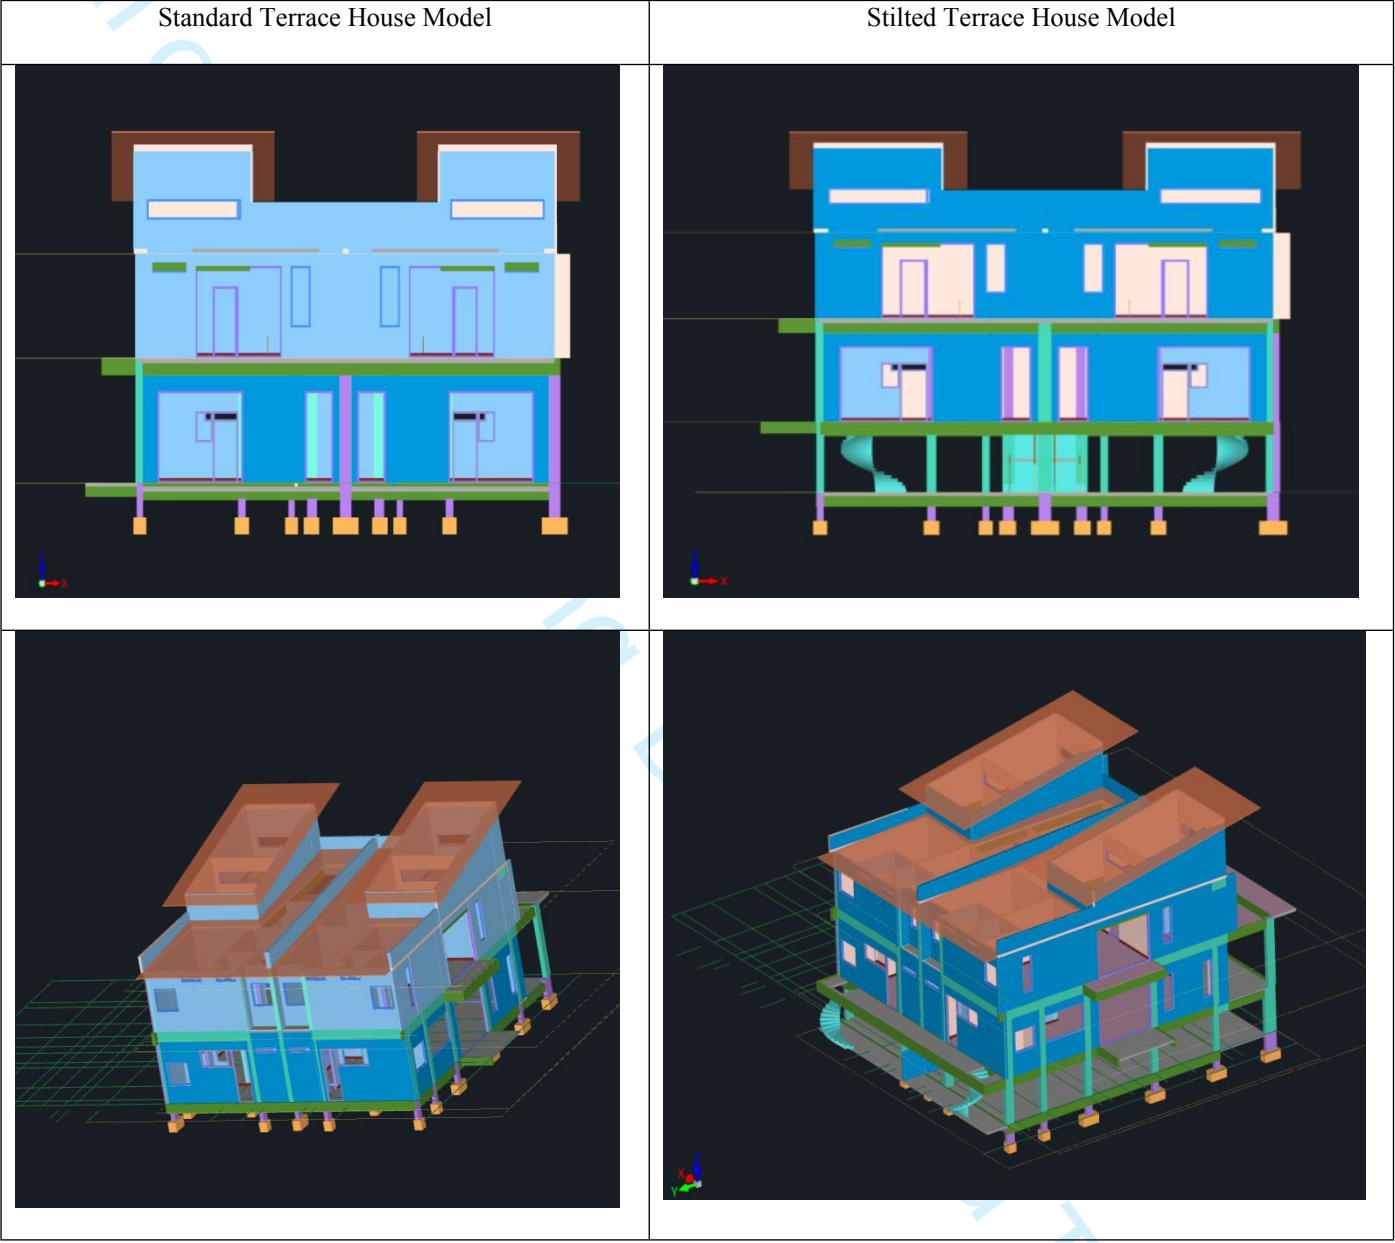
Front and side elevations of standard and stilted terrace house models
